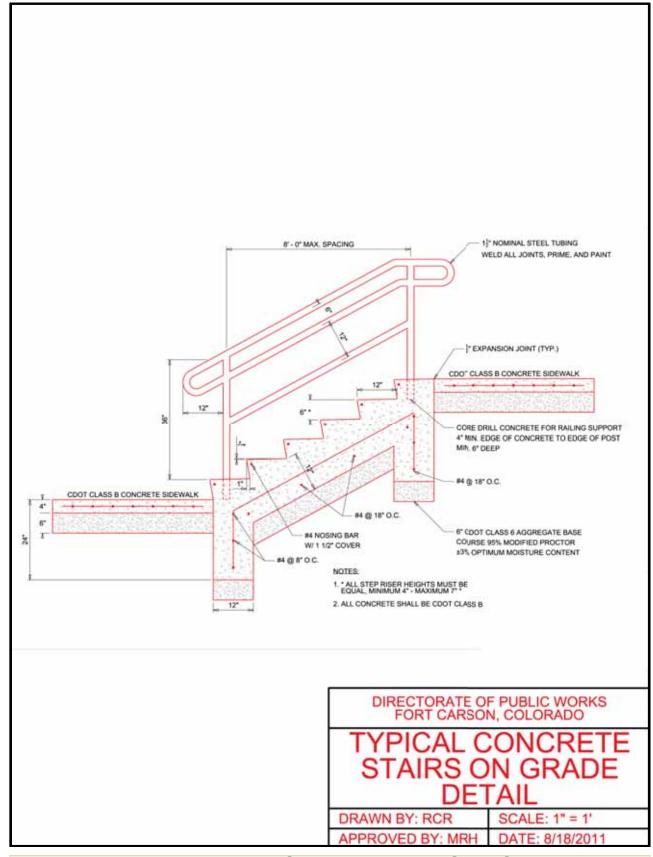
p Typical Concrete Stairs on Grade Detail
